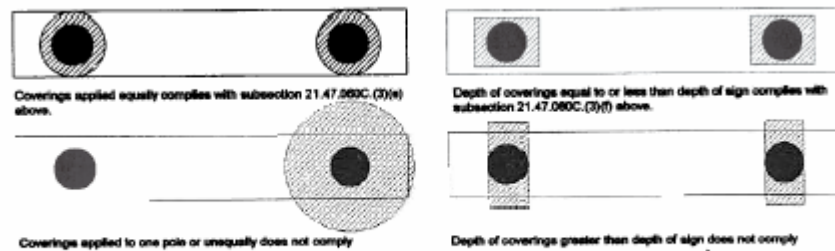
Examples of pole wrap. Poles depicted in plan view.
